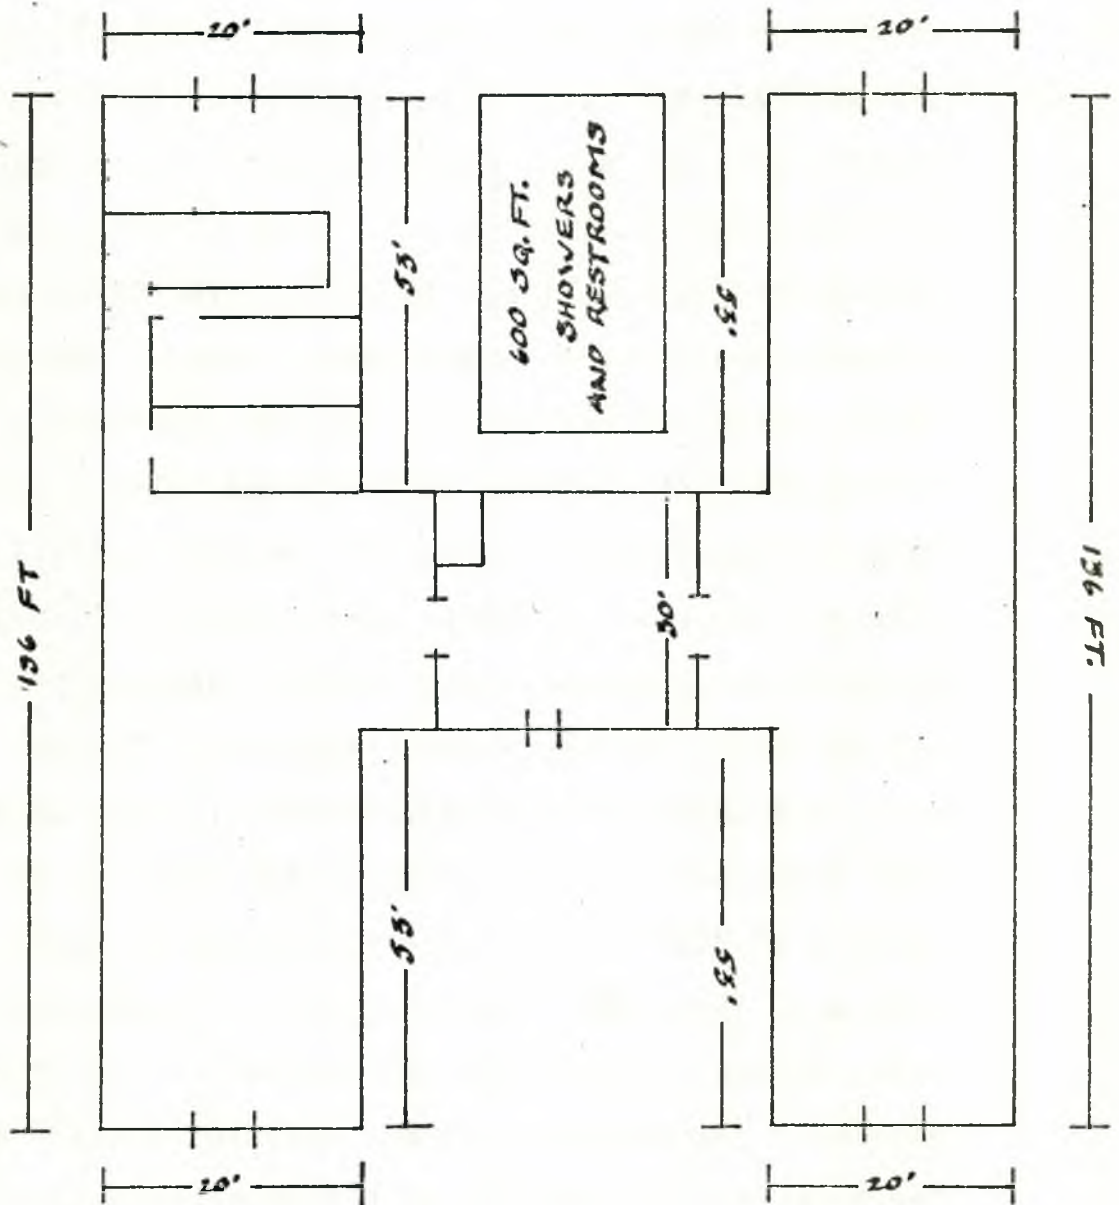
GENERALIZED FLOOR PLAN MAIN IORNI BUILDING
